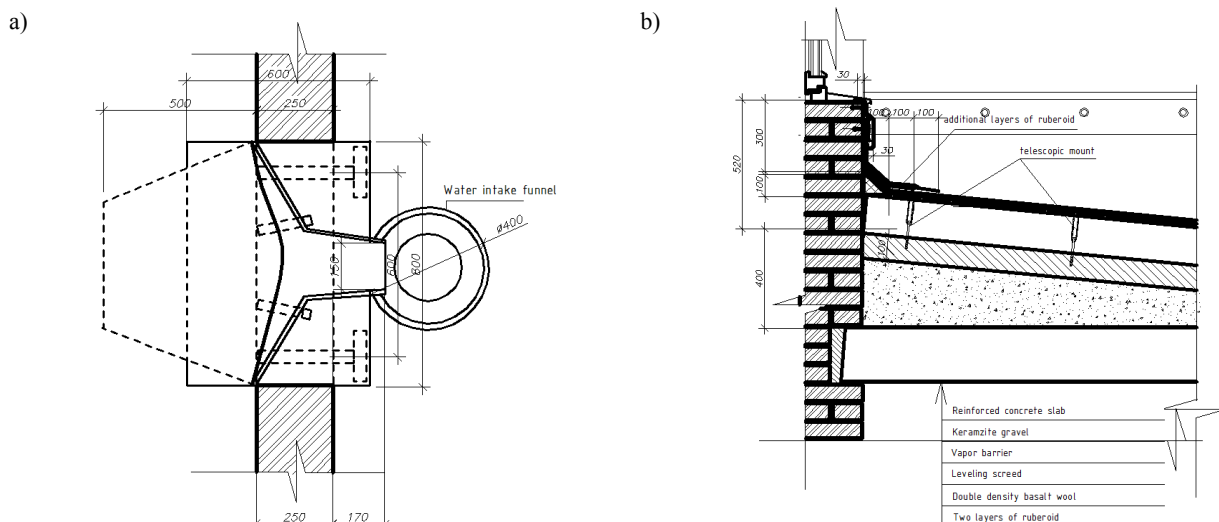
The proposed solutions are: a) a drainage unit through a hole in the parapet wall; b) a typical solution of the roofing coating junction to the roof of the combined roof.
